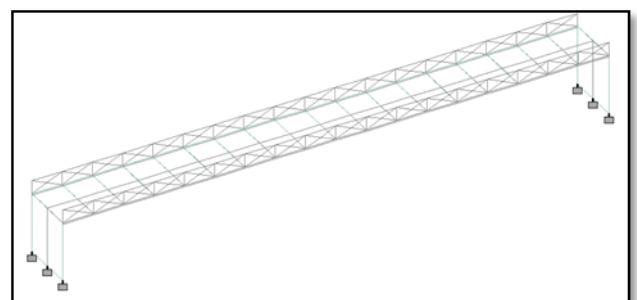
Geometry of Bridge with Jacketing as a retrofitting
